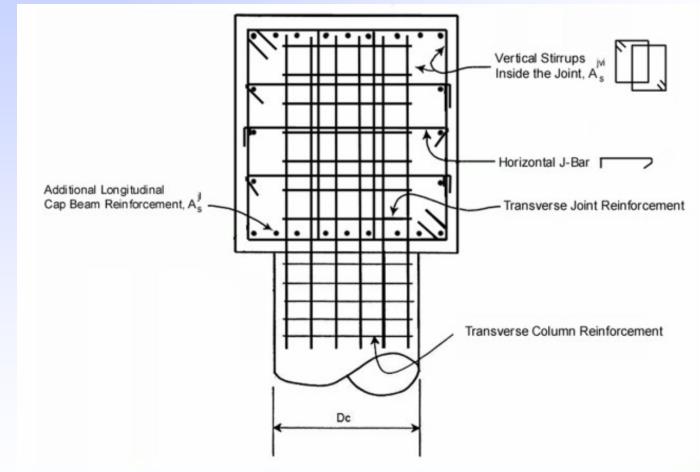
Joint Shear Reinforcement Details.
